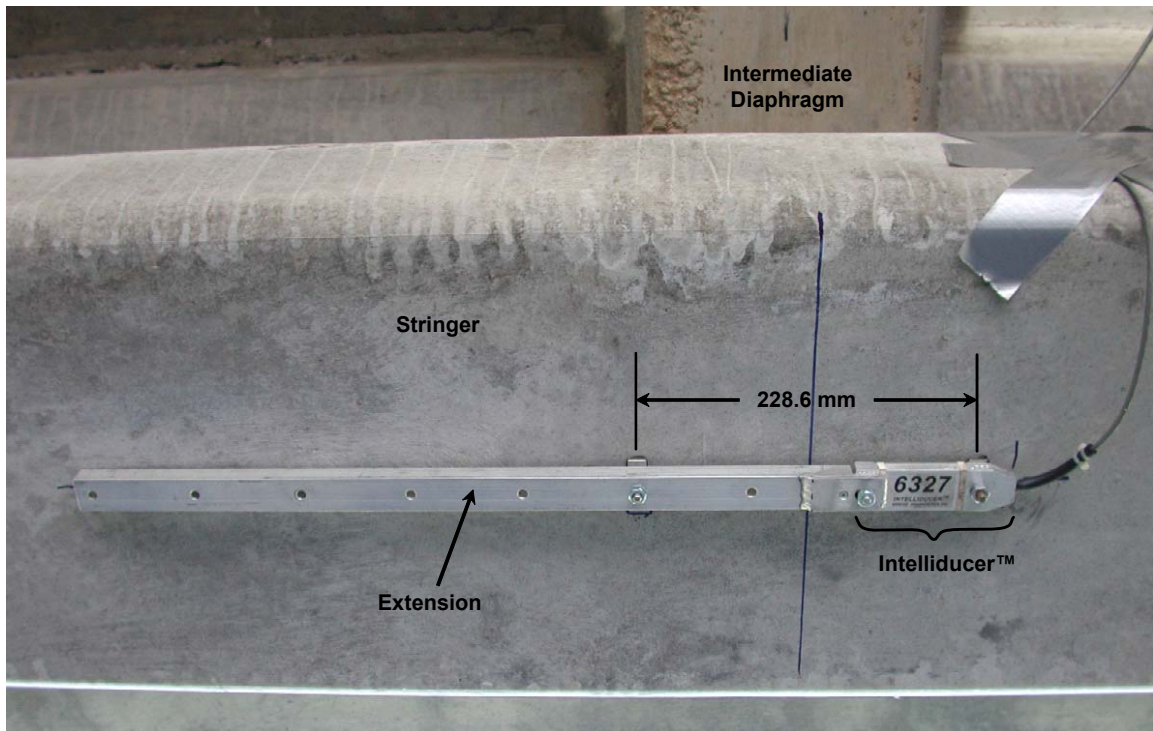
Intelliducer™ Mounted to Bottom of Concrete Girder with Extensions
